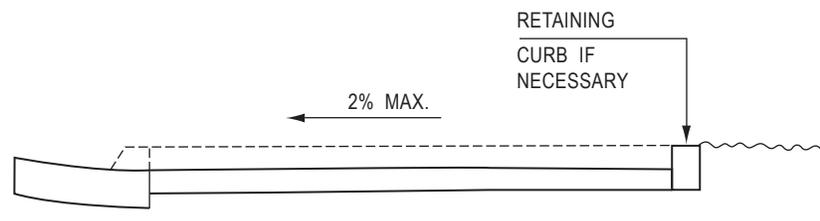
B-20D—CURB DETAIL—CASES G AND H
